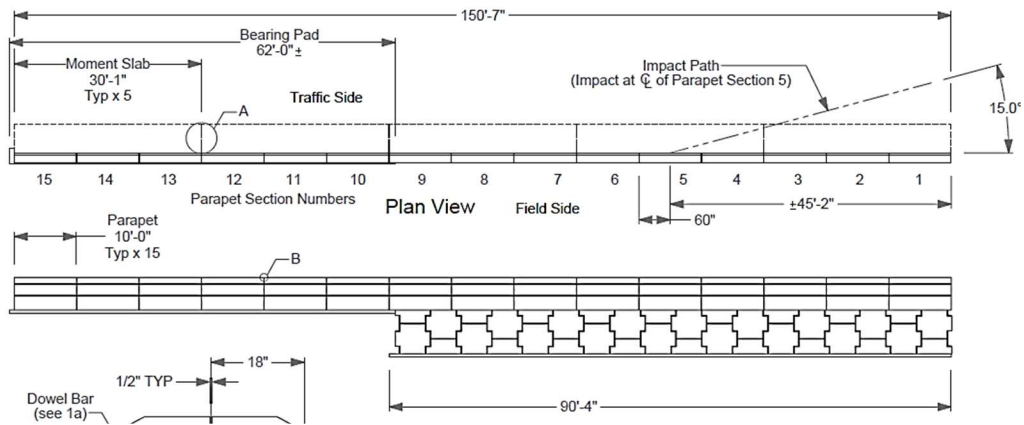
Overall Layout of the TL-4 MSE wall installation showing CIP
